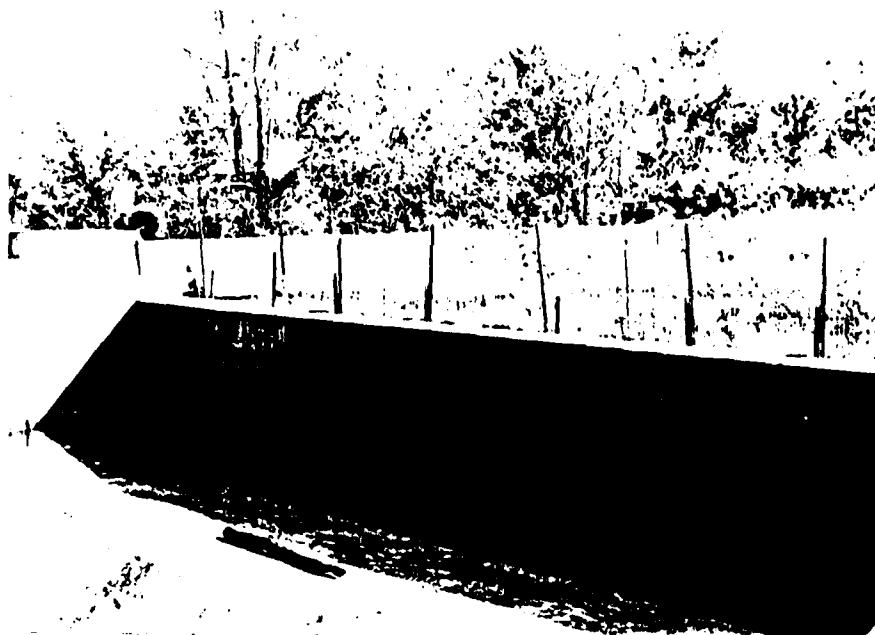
Picture of concrete overflow of service spillway taken from downstream of spillway.
